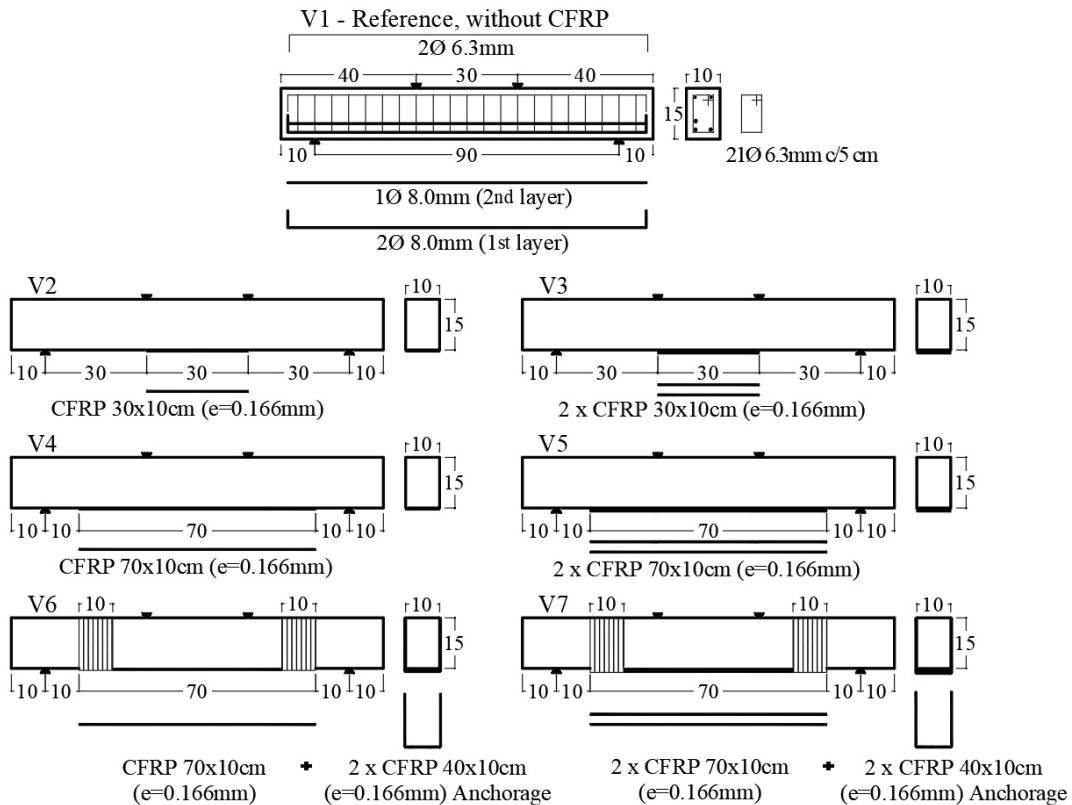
General detailing of the tested beams, where 'e' = thickness. Source: Author.
